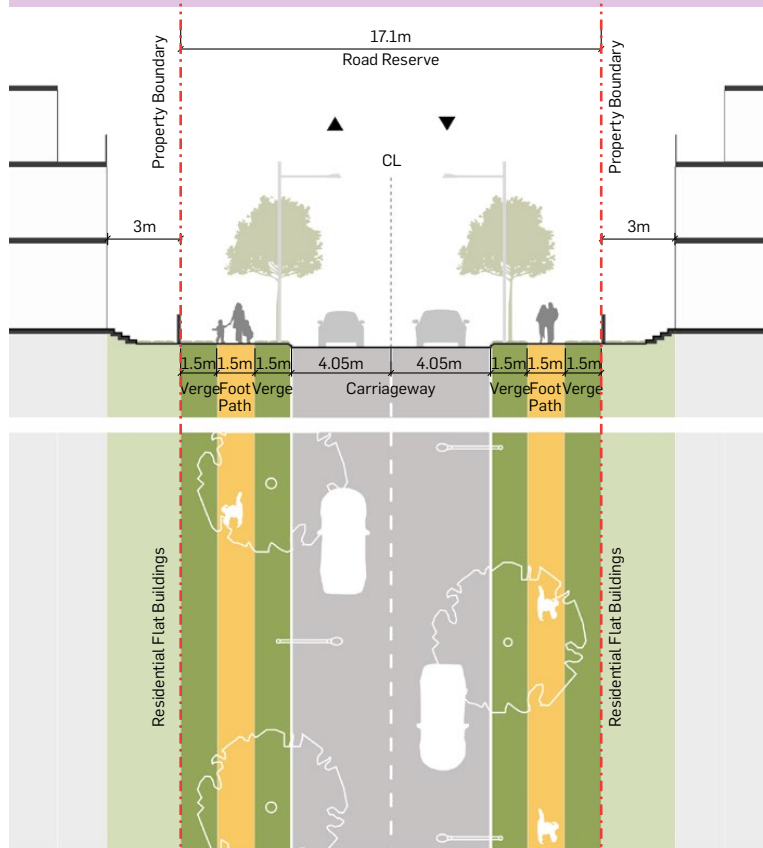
Indicative Street Section E-E' - Access Street - Type 6
